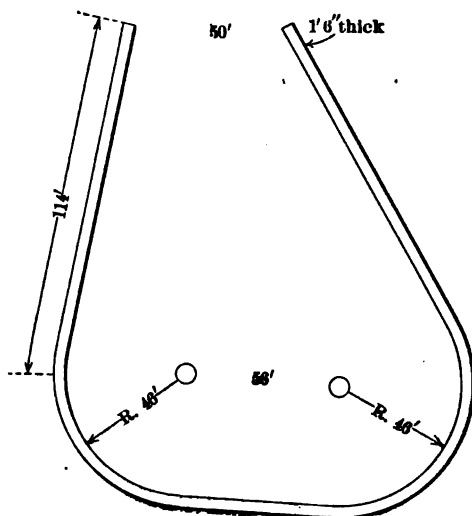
PLAN OF REINFORCED CONCRETE RETAINING WALL SHOWN IN FIG. 4.
